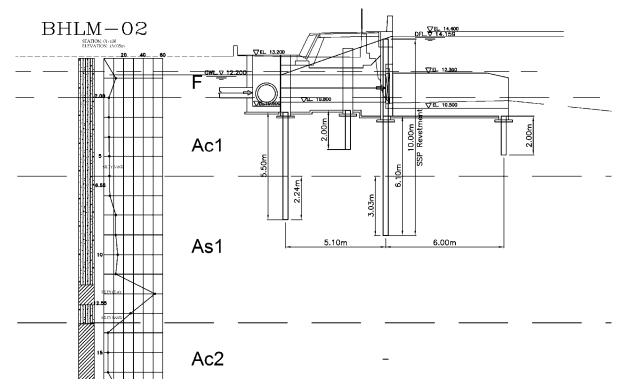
Length of SSP Cut off Wall (1/9) (MSL-1)
